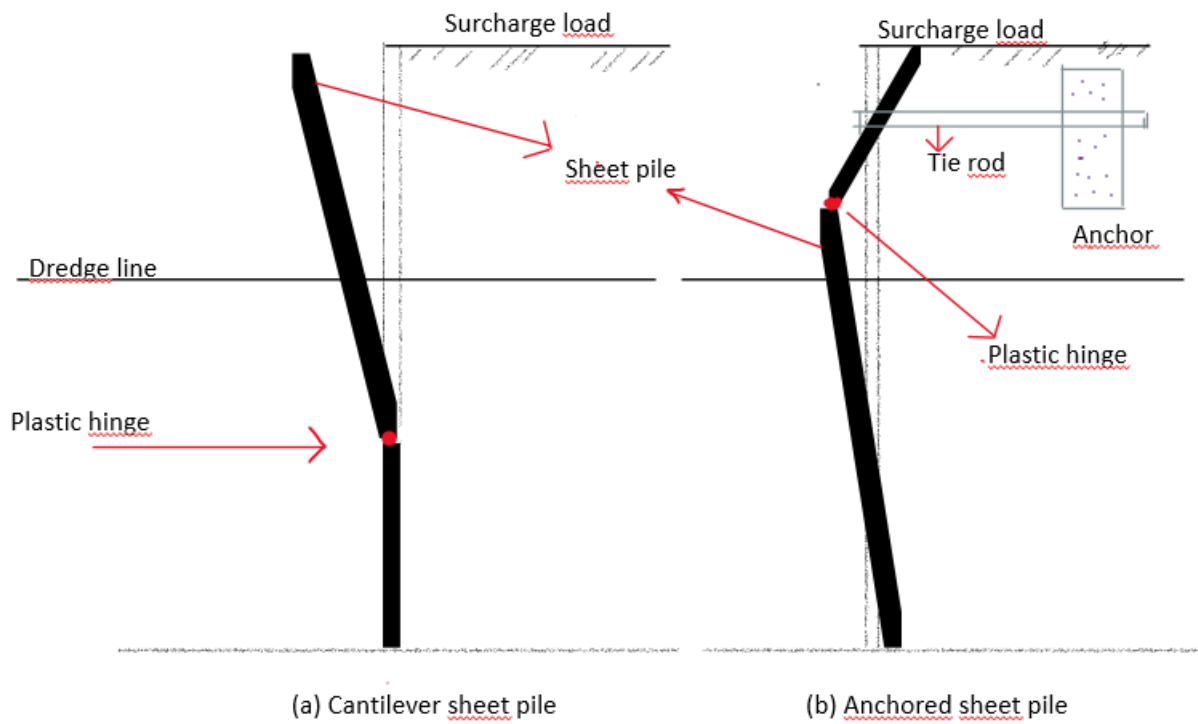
flexural failure of cantilever and anchored sheet piles. Illustrated by Yonas Tsighe
